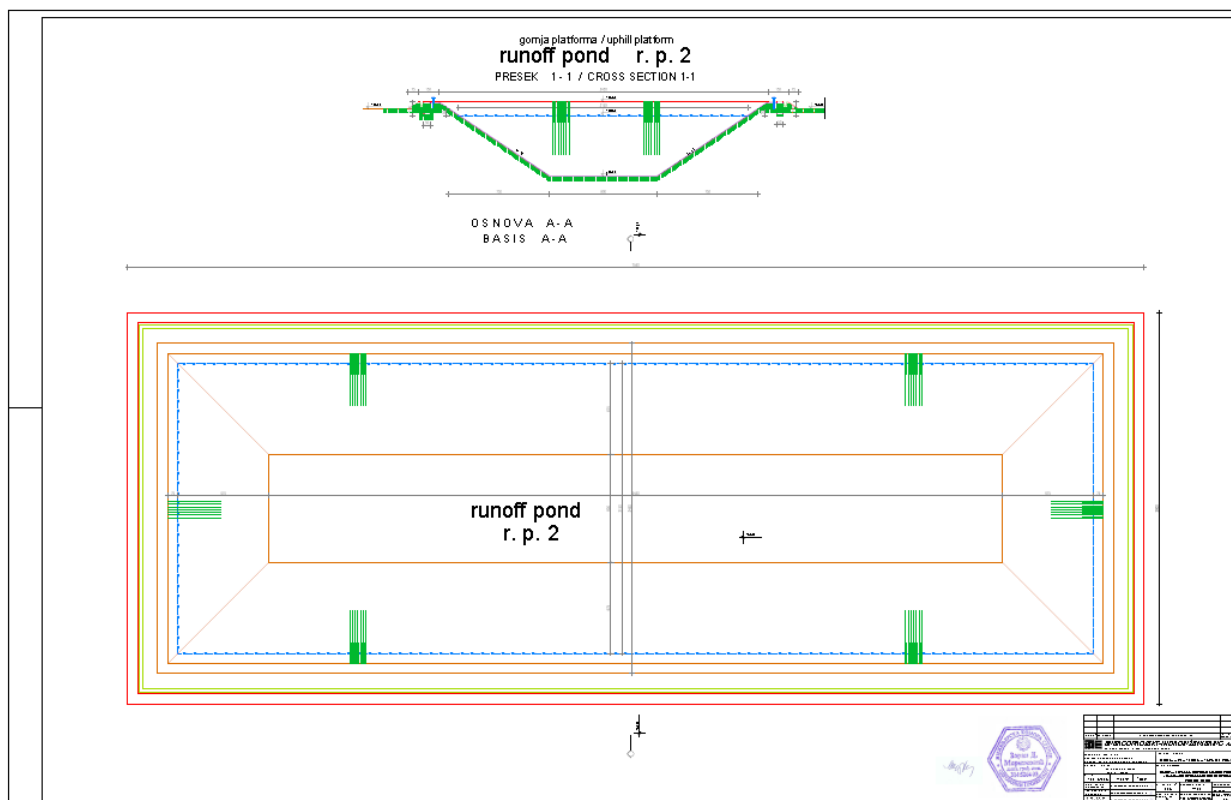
Atmospheric water pond on the Upper Platform (Source: IDP Book 3/5 Hydrotechnical installation design, Energoprojekt Hidroinženjering, May, 2019)
